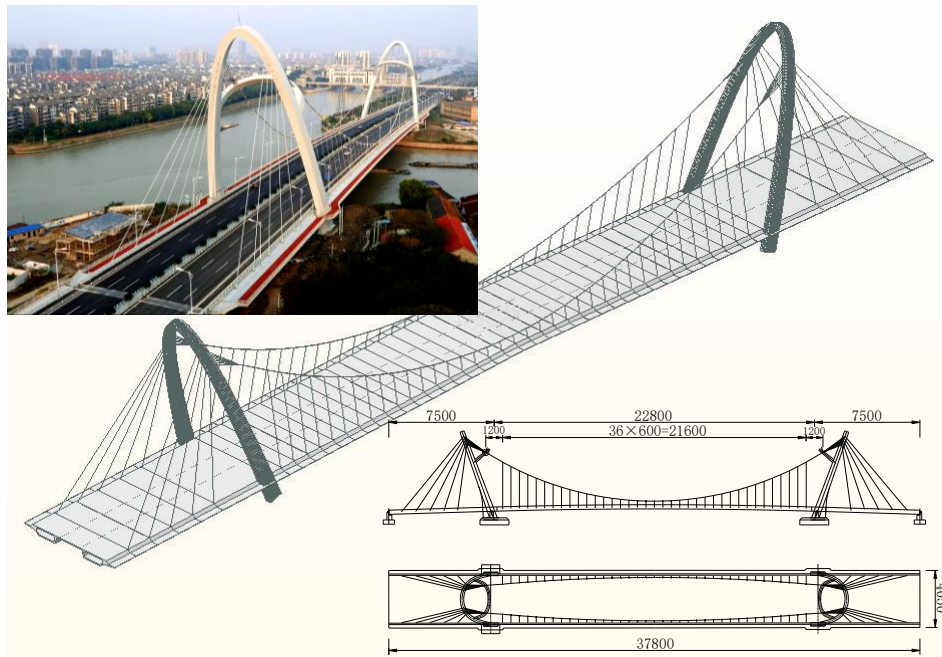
General view and layout of Dongtiao River Bridge (Dimensions are in cm. Photo provided to the first author by Mr. Chengshu Wang of Traffic planning and Design Institute of Zhejiang Province)
